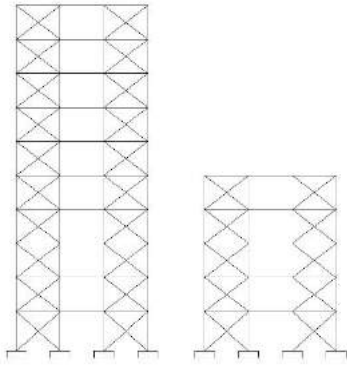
Frames System with Bracing Elements (Frame no 1)
